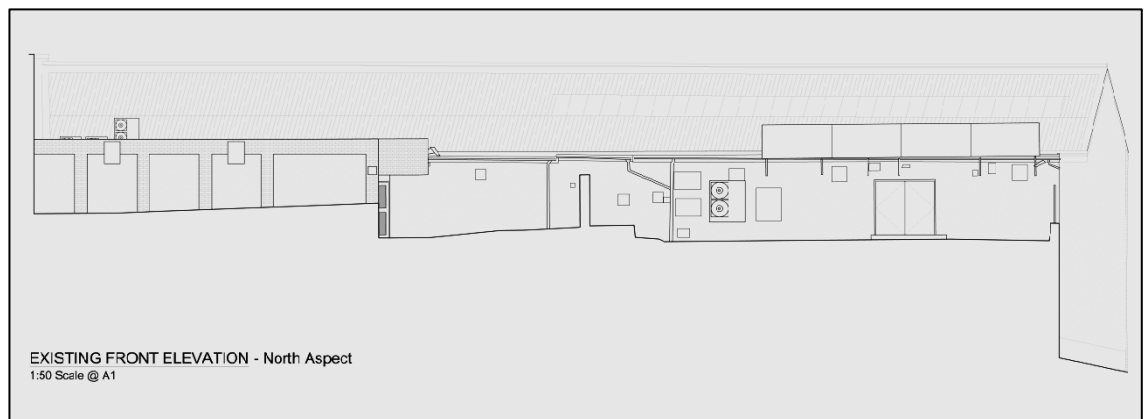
existing elevation to Coracle Way and array of projecting flat-roofed additions
